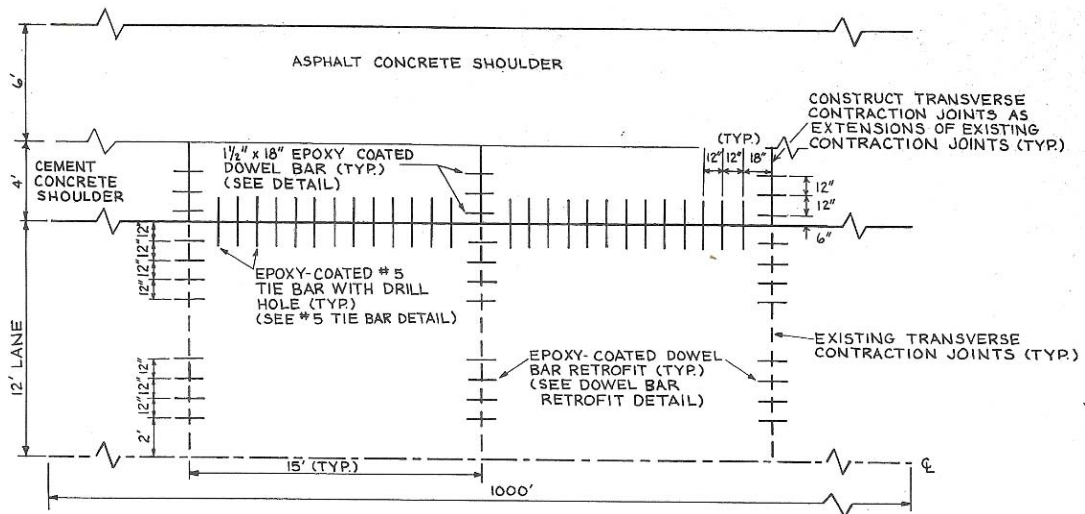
Dowel bar retrofit with concrete shoulder beam plan view.
